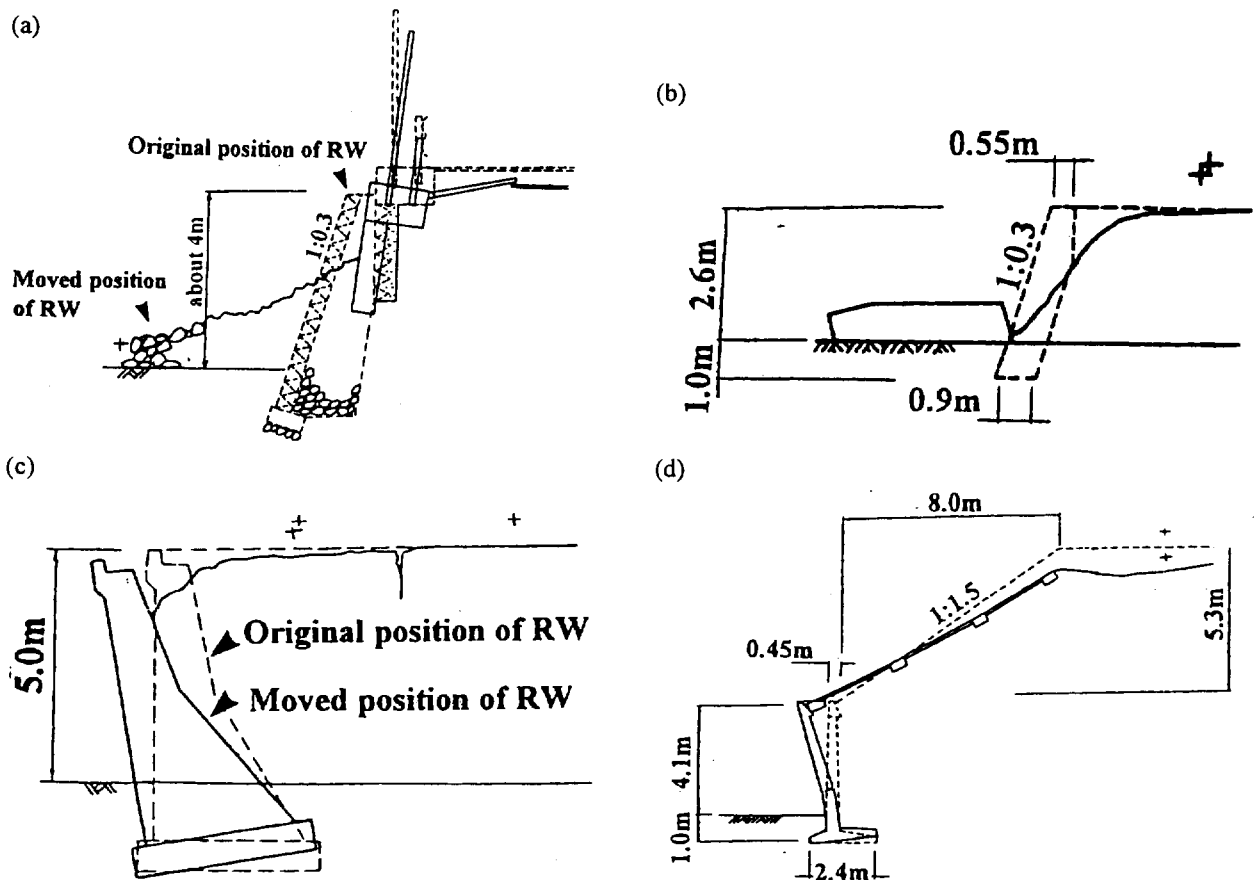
Cross-sections before and after the earthquake of seriously damaged or totally collapsed RWs; a) a masonry RW between Setsu-motoyama and Sumiyoshi Stations; b) a leaning-type RW between Setsu-motoyama and Sumiyoshi Stations; c) a gravity-type RW at Ishiyagawa Station; and d) a poorly designed old cantilever RC RW at Shin-nagata Station
